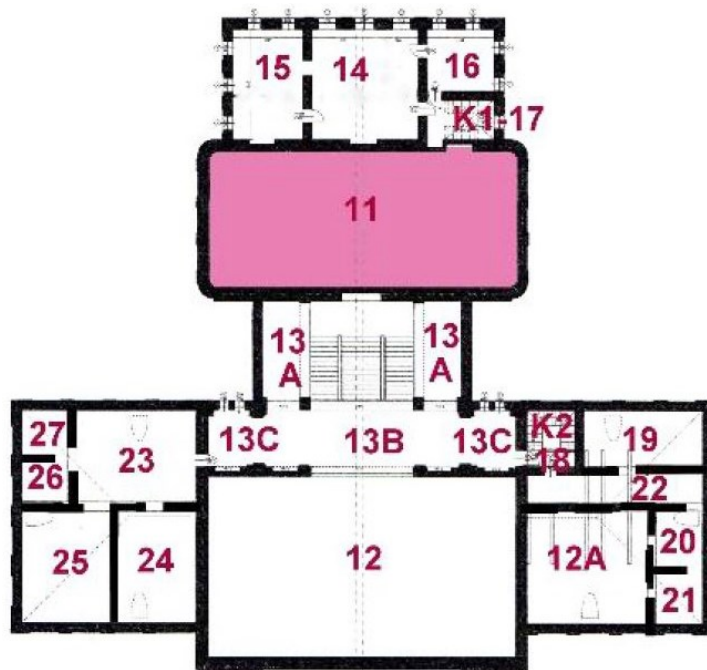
The ground floor plan of Officers' Casino. Ballroom is marked in colour
